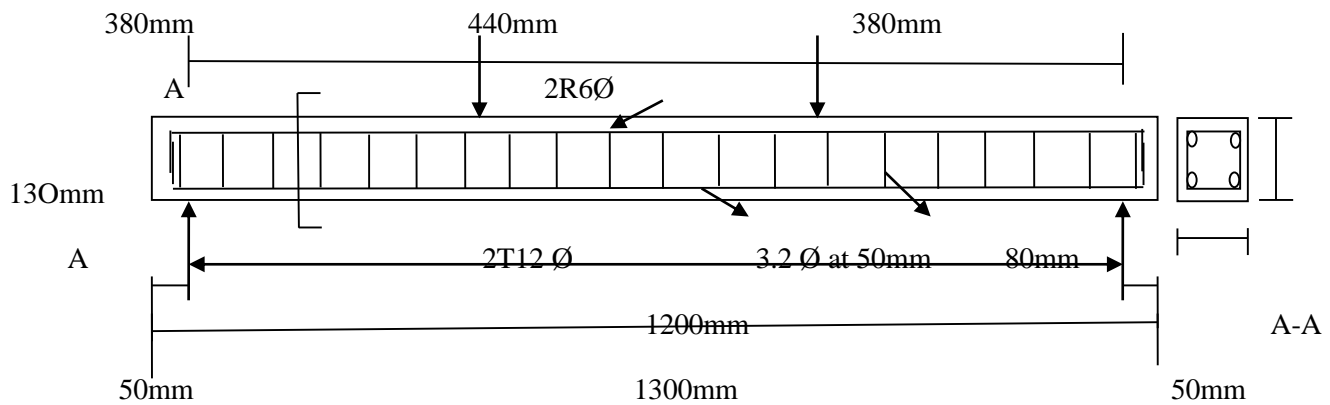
beam 4 - beam with links and good anchorage of longitudinal reinforcement.
